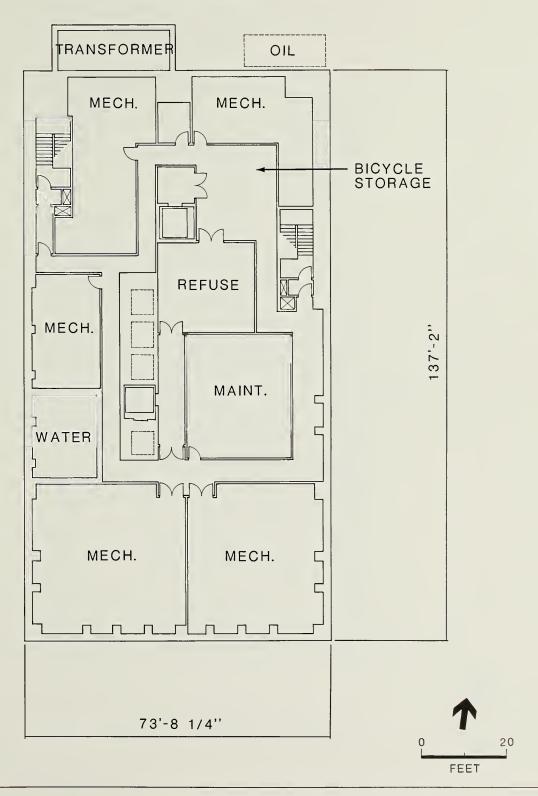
235 PINE BASEMENT LEVEL PLAN
